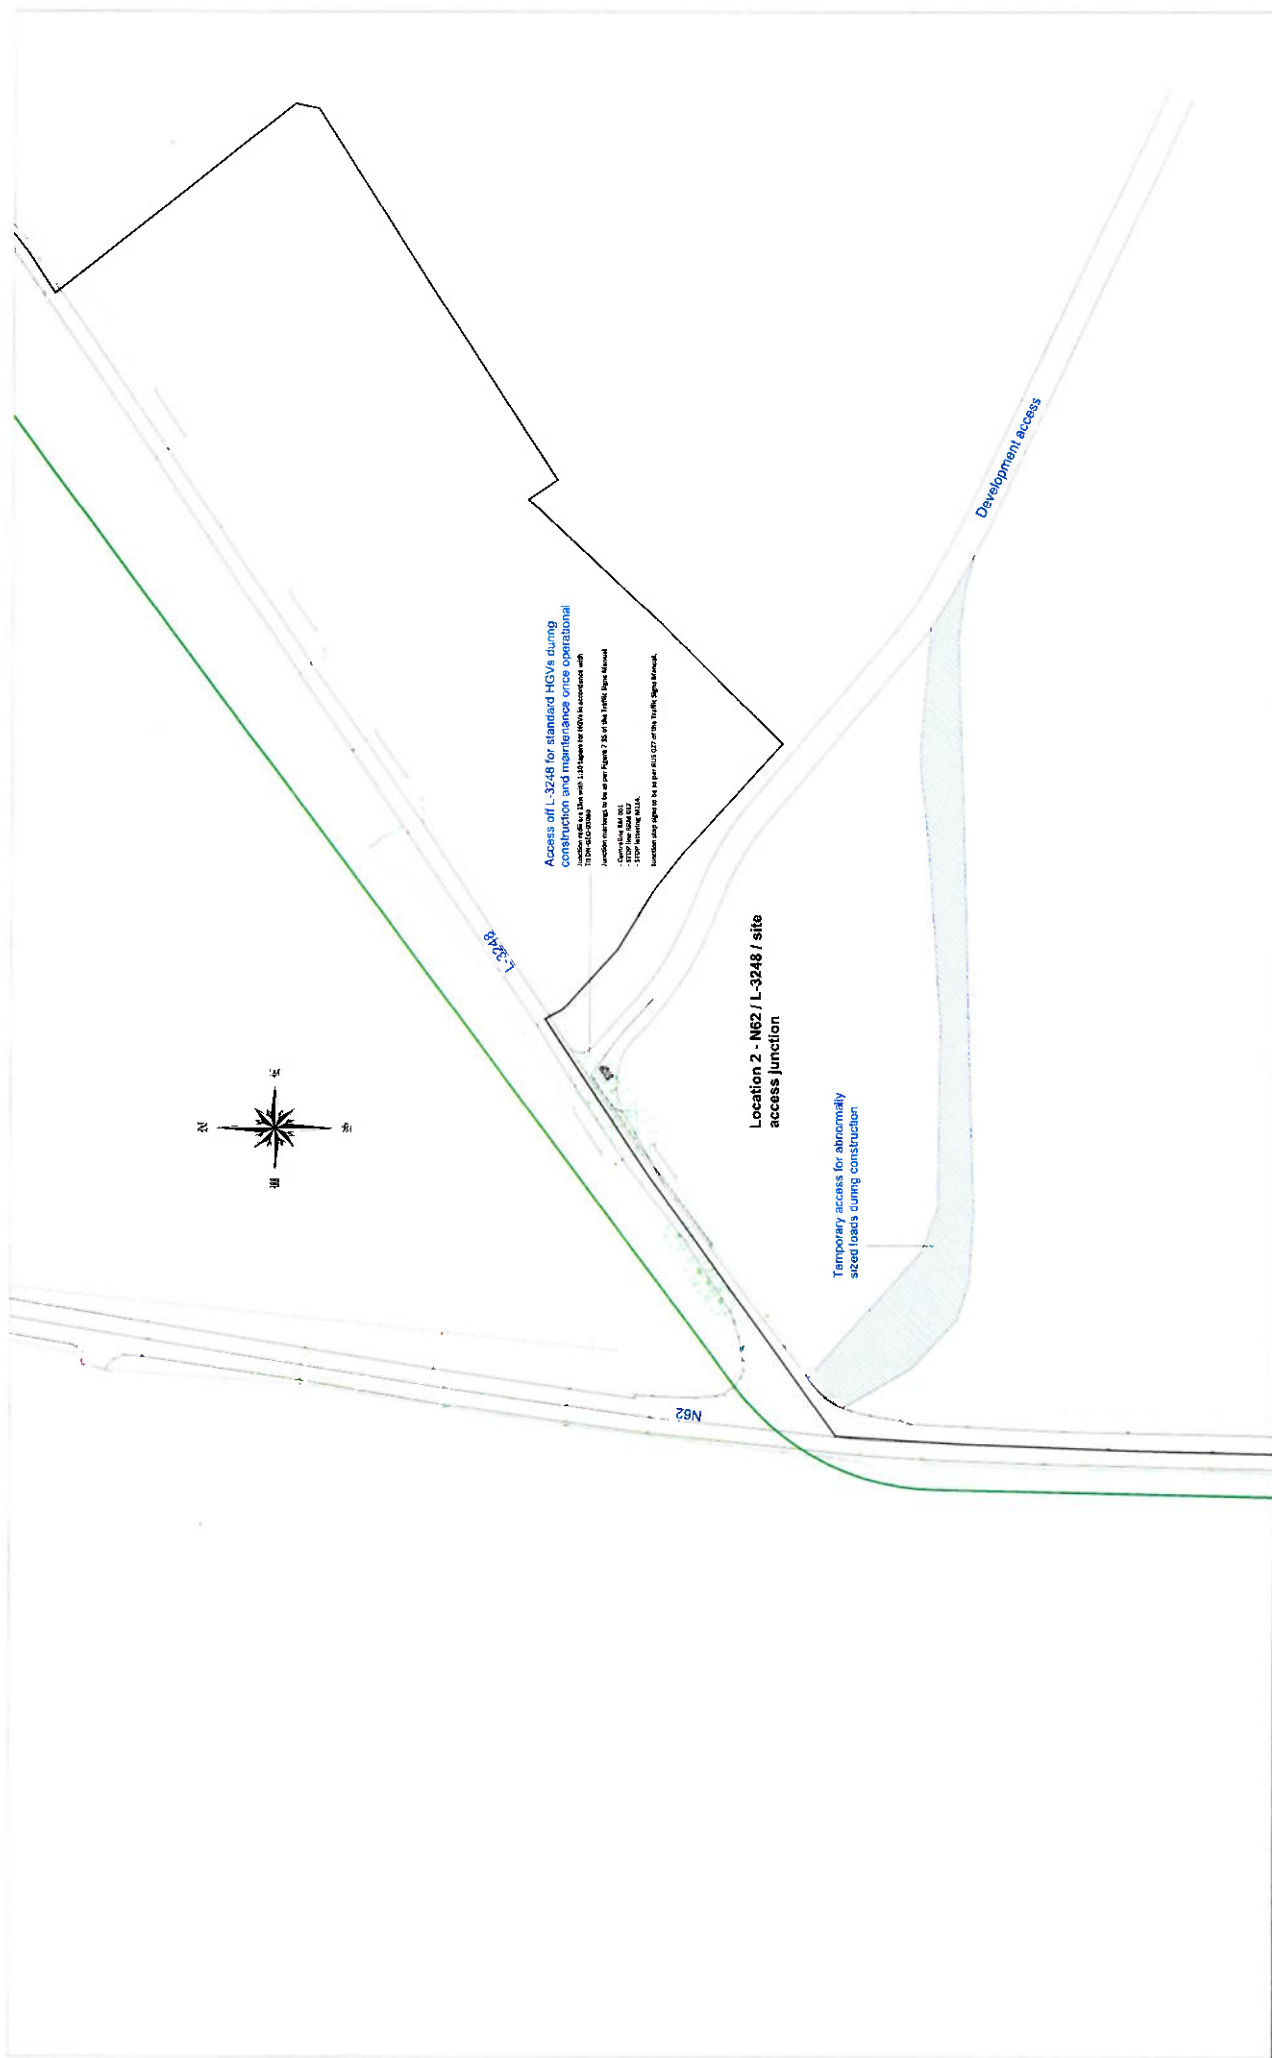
Location 2 - N62 / L-3248 / site access, junction layout
